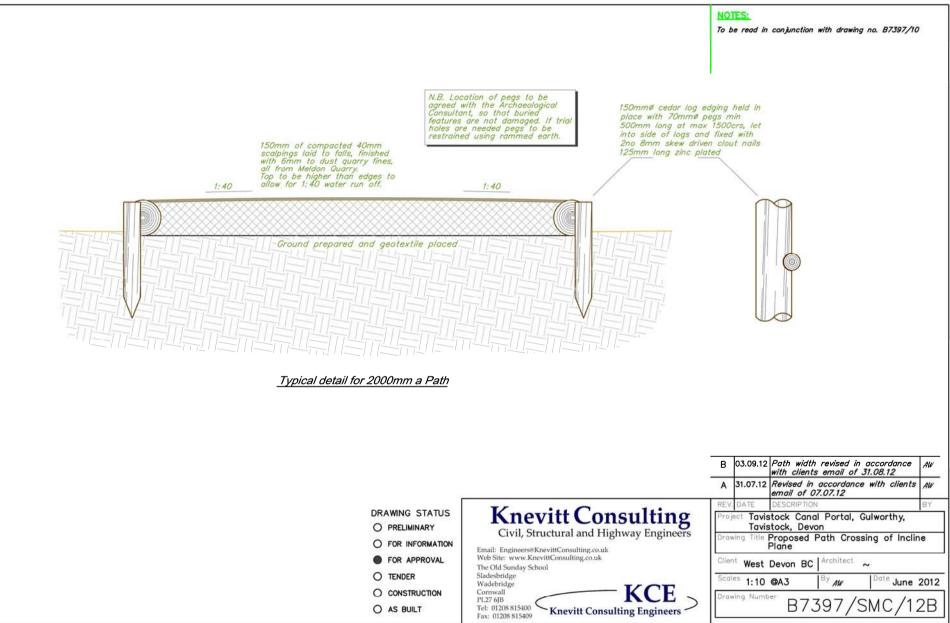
CAD section drawing of impact remediation for crossing incline track bed (Knevitts)
